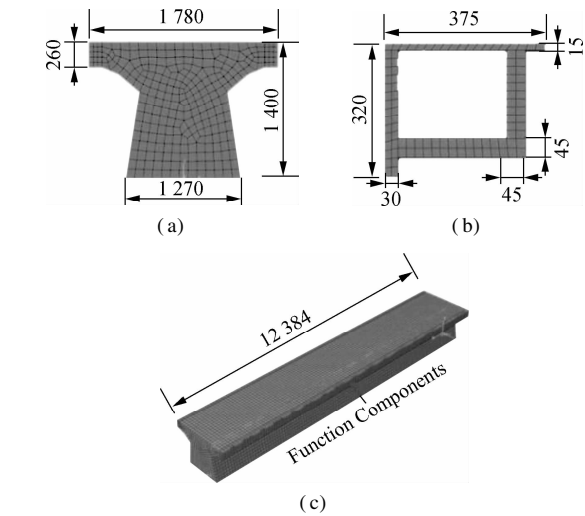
Structure of the 12.384 m high-speed maglev guideway. (a) Cross-section view of the guideway structure; (b) Cross-section view of the reaction rail structure; (c) The model of the 12.384 m guideway structure
